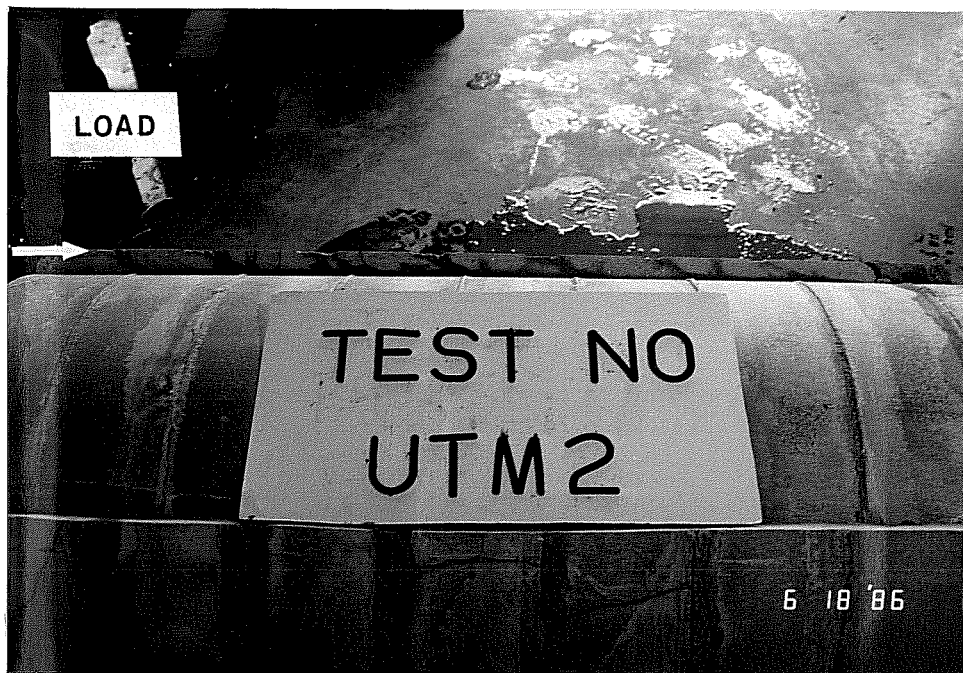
Grout profile of Specimen UTM2 showing crack pattern
